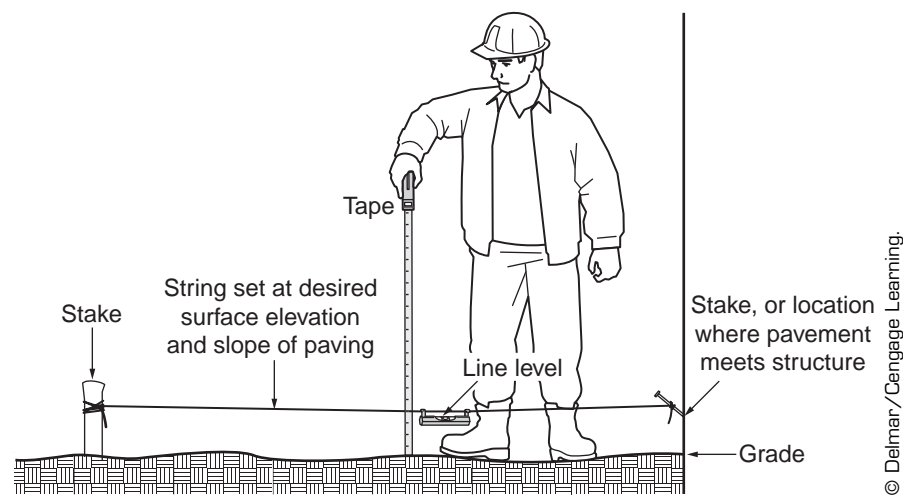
Checking the cross-slope and depth of pavement excavation.
